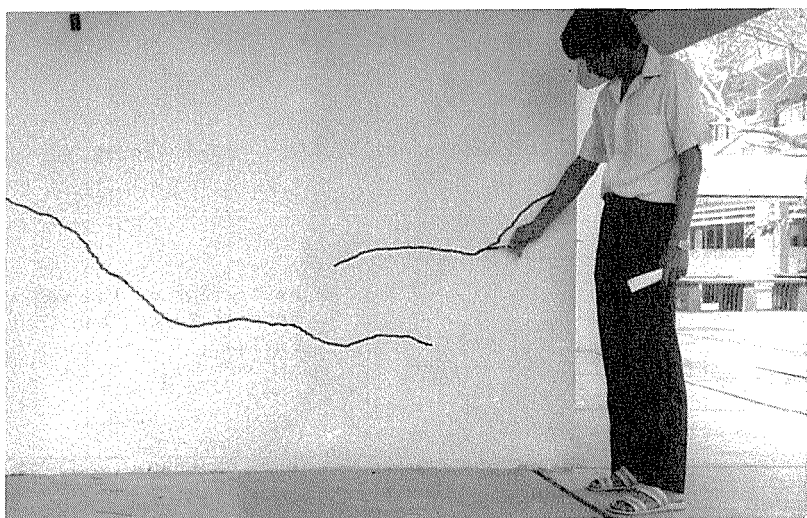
Cracks in the First Floor Walls in SEC and GTE Building
